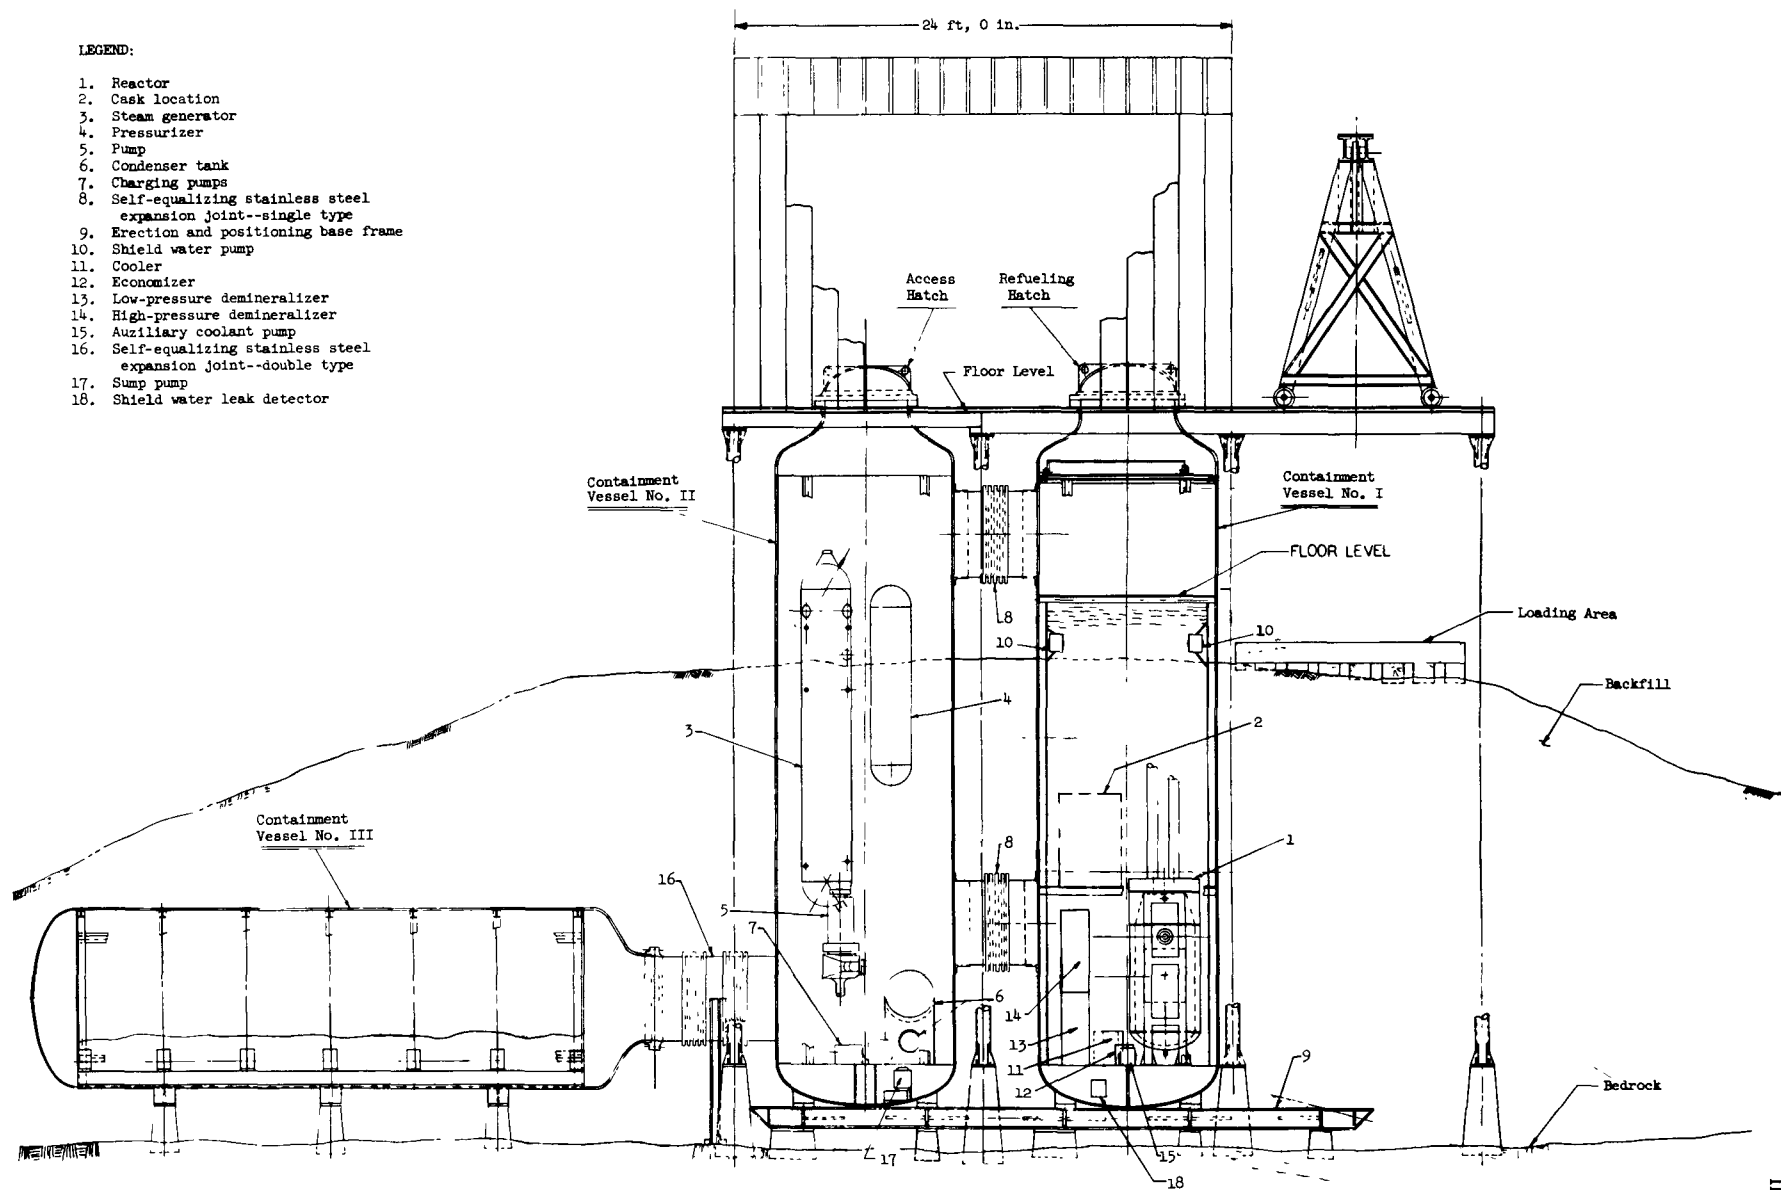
Primary System Layout--PM-1 Power Plant (contained)
